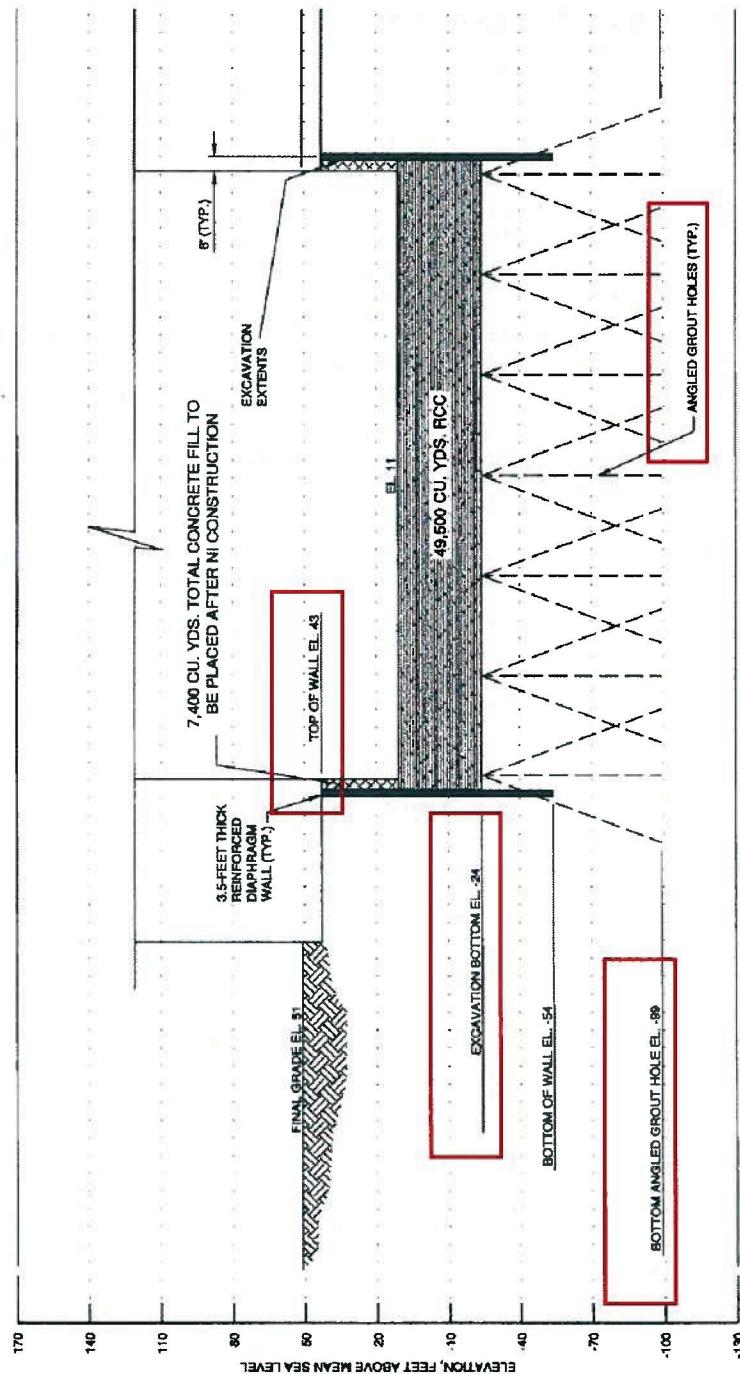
SCHEMATIC CROSS SECTION OF NUCLEAR ISLAND, DIAPHRAGM WALL, AND GROUTED BEDROCK
